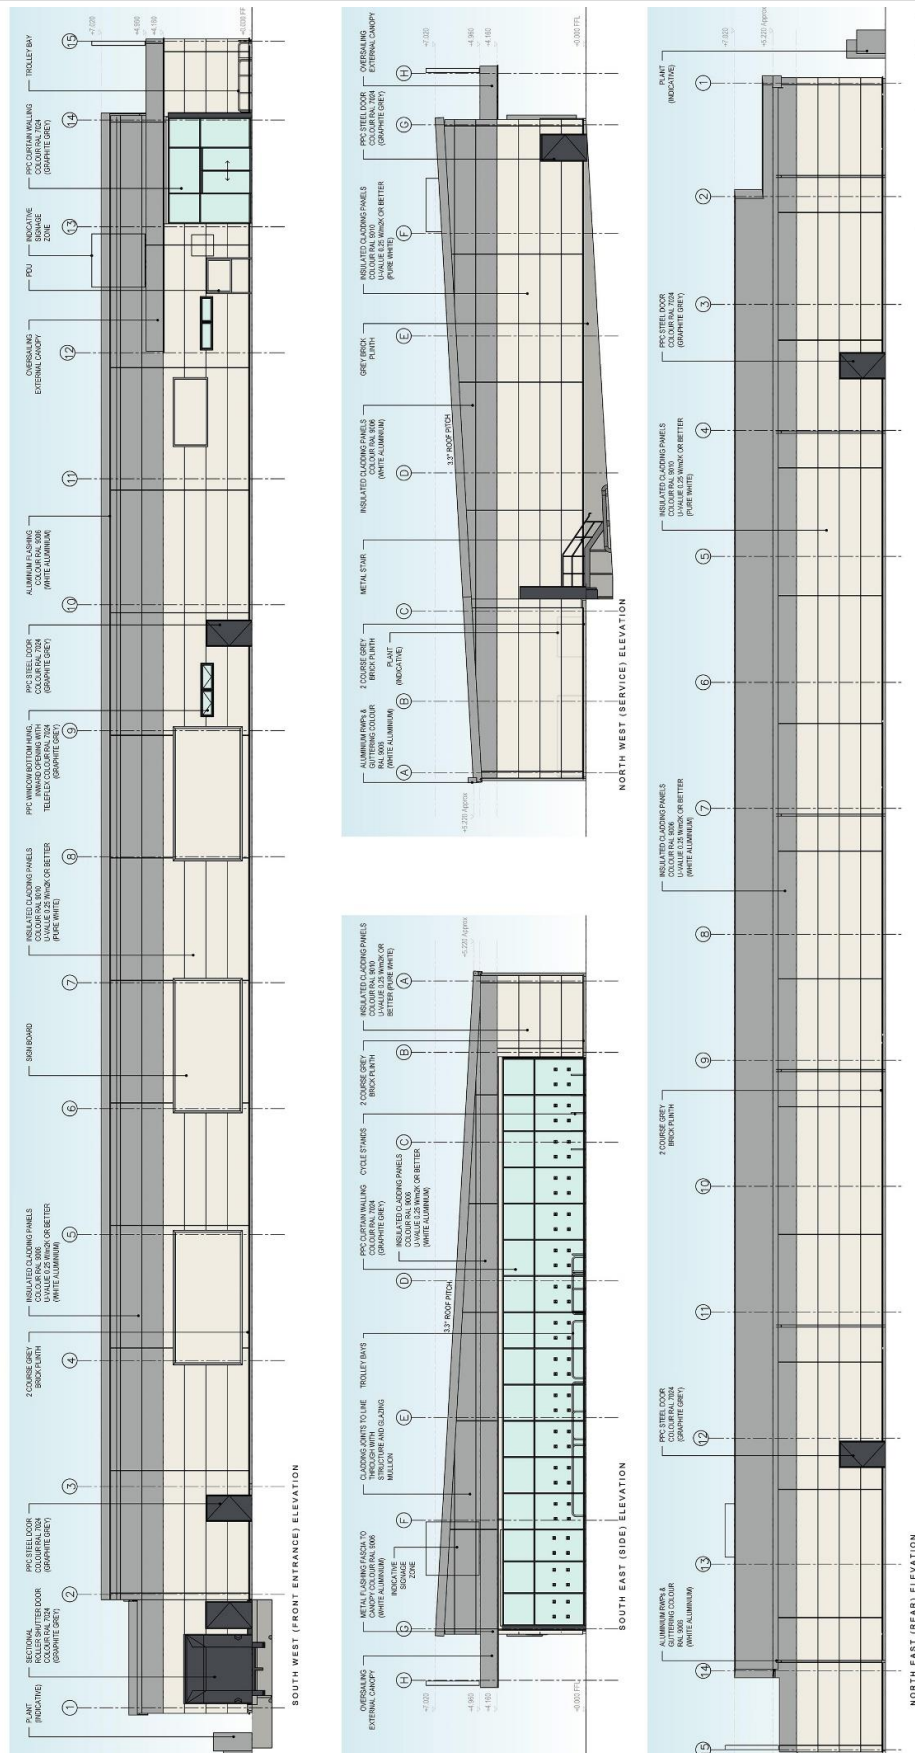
Elevations of Lidl Foodstore showing location of loading bay
